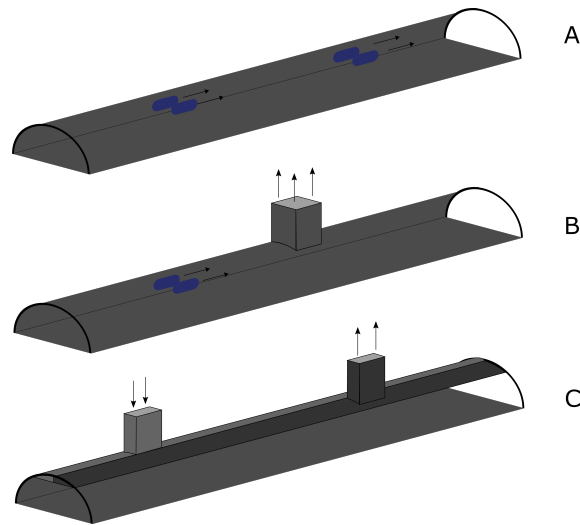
Tunnel ventilation types, A) longitudinal, B) semi-transversal, C) transversal
